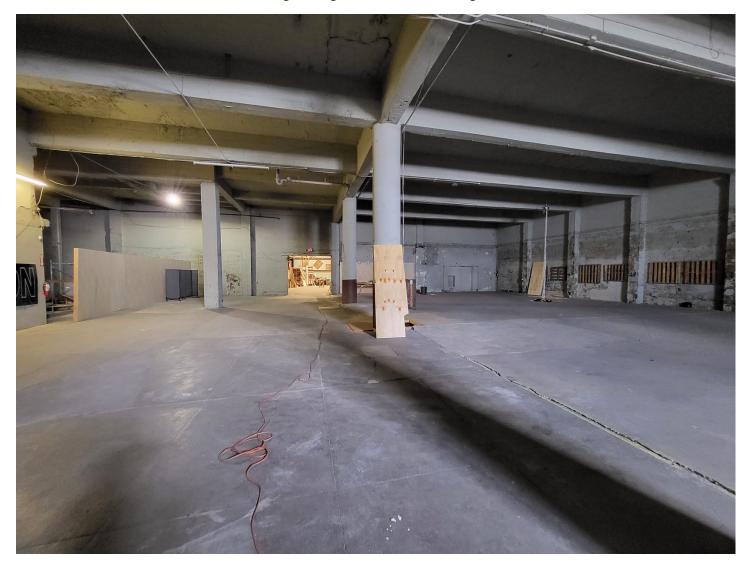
Interior of metal building addition looking toward south wall of the main building. Facing north.
